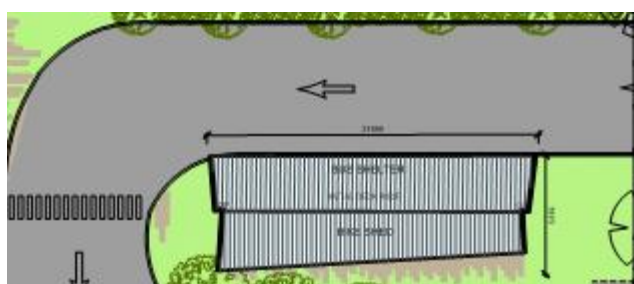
Image of the proposed bike shed. Source: Terroir Proposed Junior School Landscape Plan and Details, Block M and Bike Shed.
